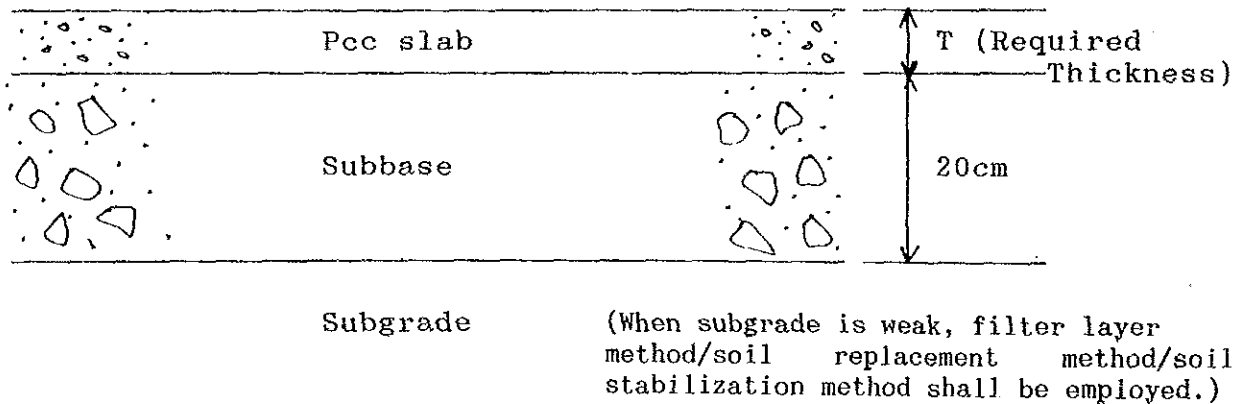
TYPICAL CROSS SECTION OF PCC PAVEMENT
